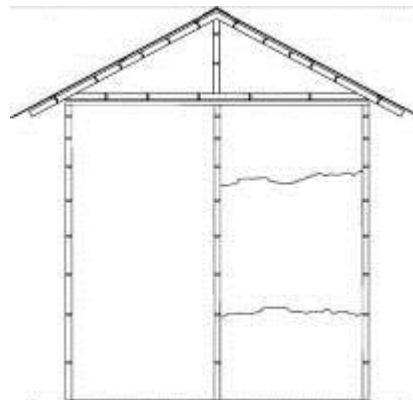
(b): Outside crack pattern of bamboo house on pendulum side
